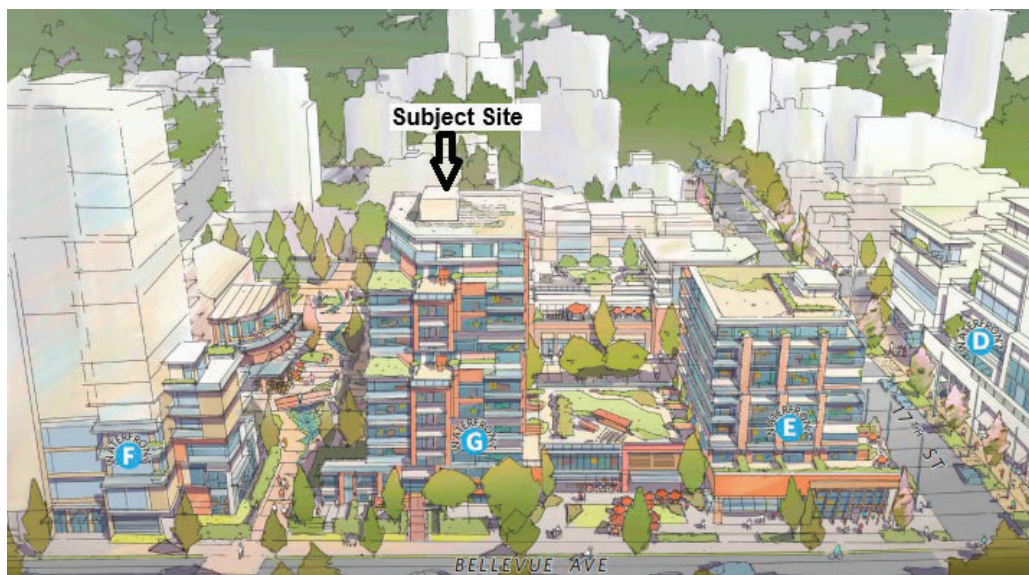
Artist’s illustration of Waterfront designations for 1700-block of Bellevue Avenue in draft Ambleside Centre Local area Plan
